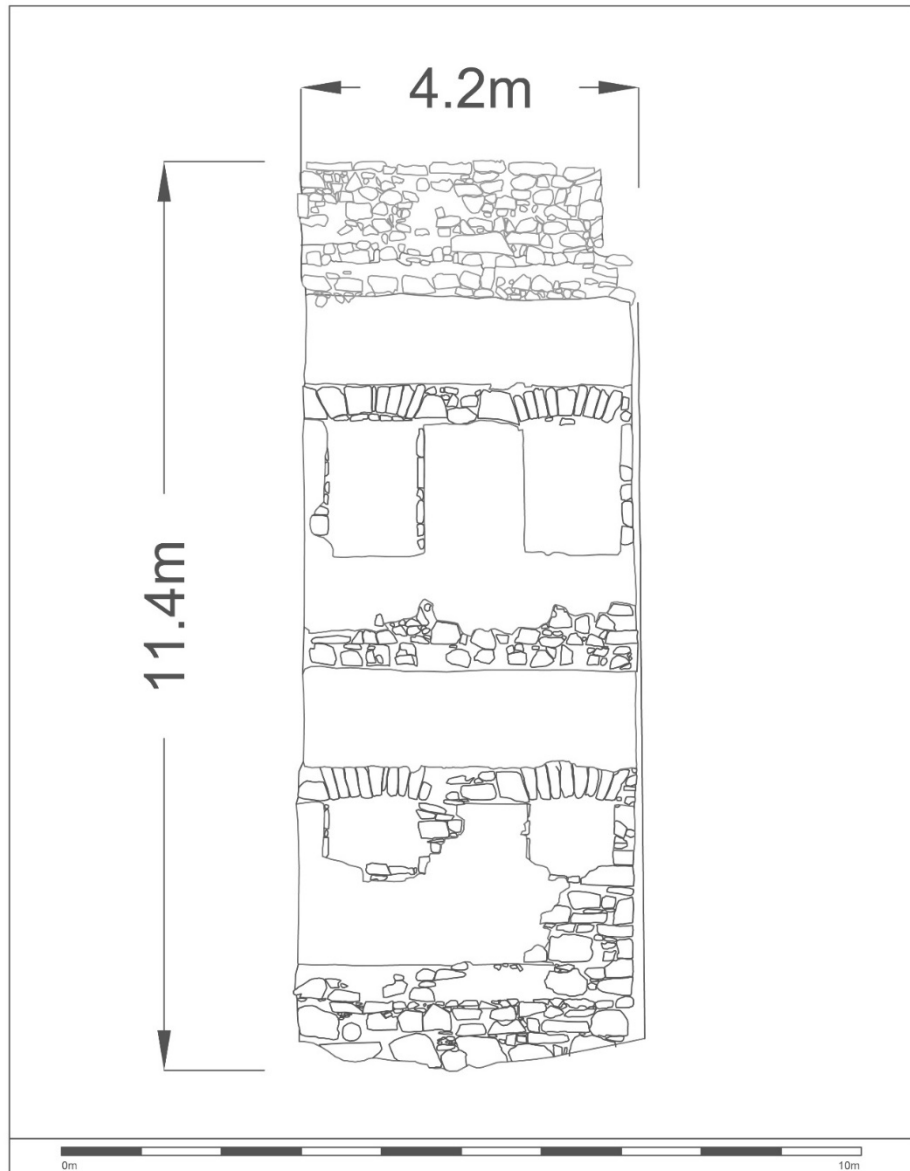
Internal elevation of the north-west wall of the signal tower at Golam Head Signal Station.
